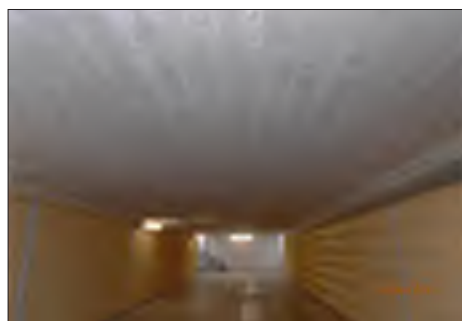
Ramp for the disabled persons and the pedestrian underpass of the railway station Slavonski Brod
